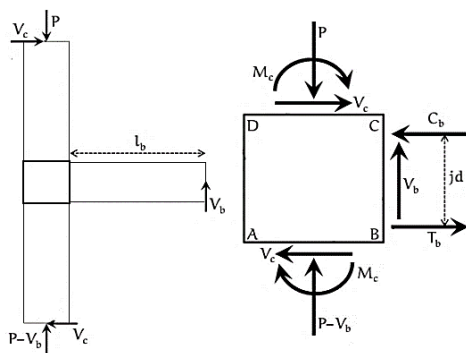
Equilibrium of the joint and the forces exerted on it.
